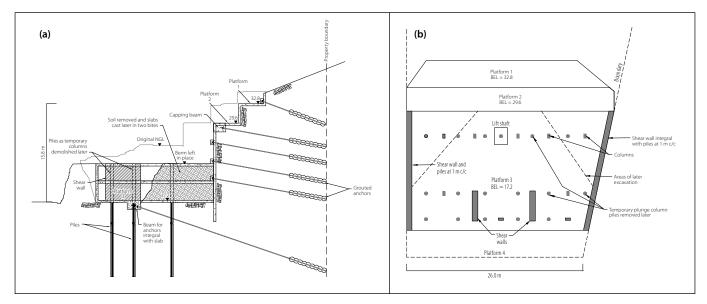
(left) Cross section through lateral support system at Boulder apartments and (right) plan view showing location of shear walls and plunge columns
